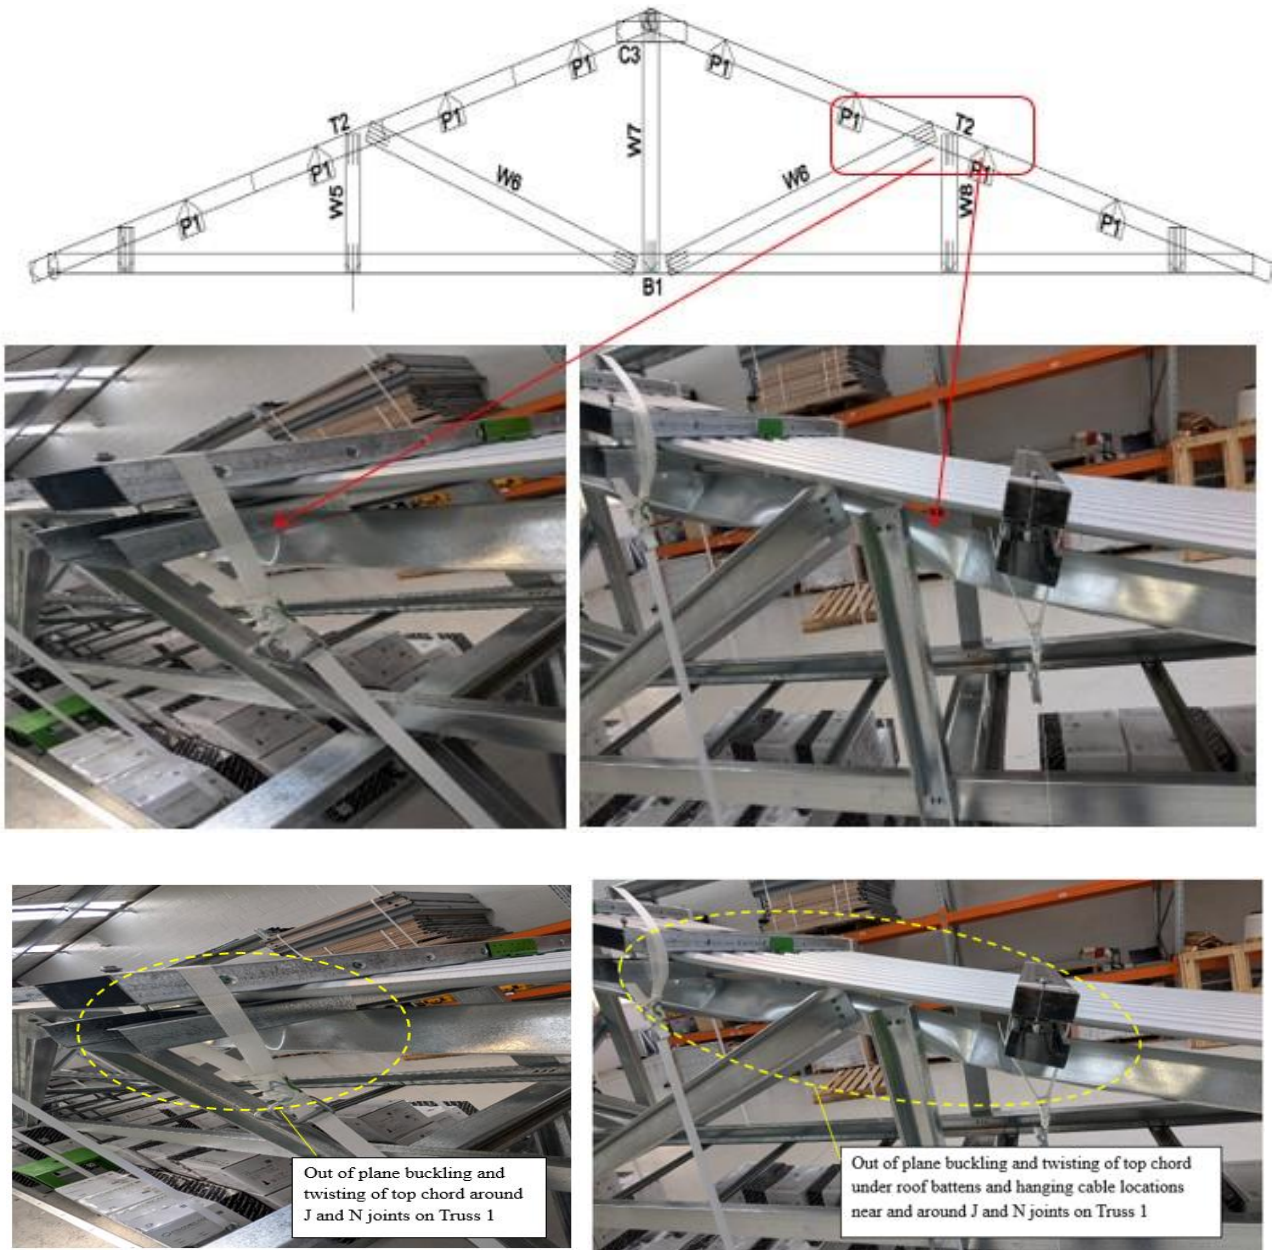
Lateral torsional buckling failure on Truss Assembly of Test 3
